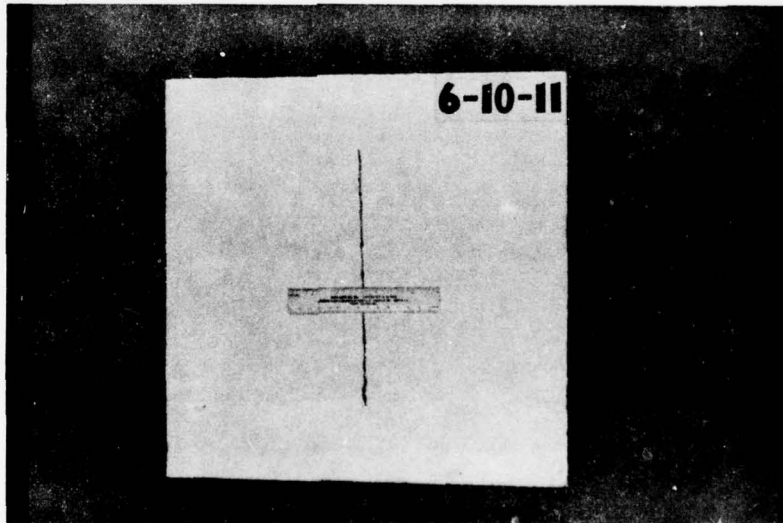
Coated side of bonded concrete slab with hairline crack.
